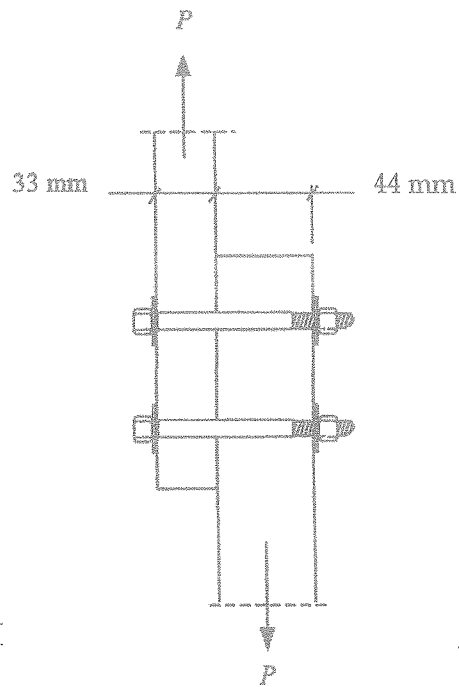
(b) - ii :Bolted Joint between Tie Beam and Rafter
